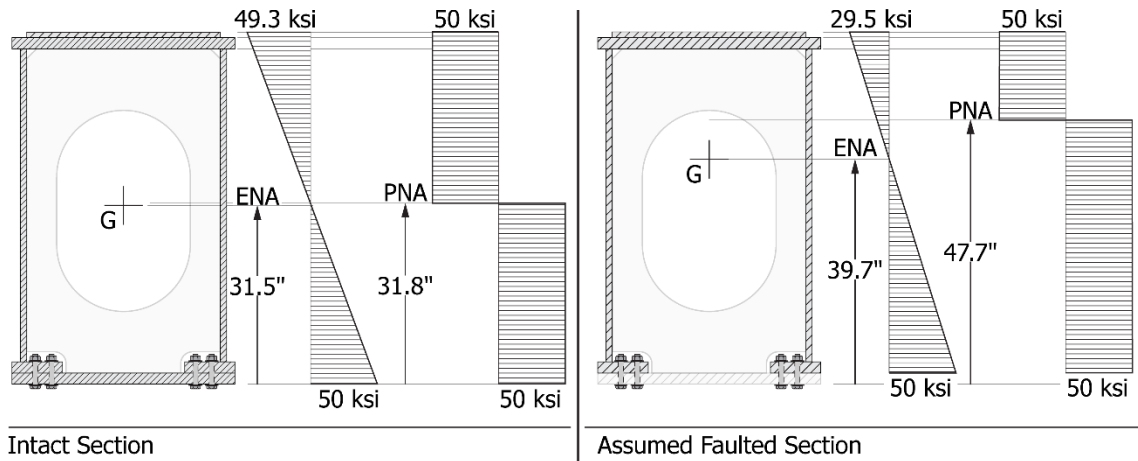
Specimen B1: sectional analysis of undamaged/intact and faulted sections
